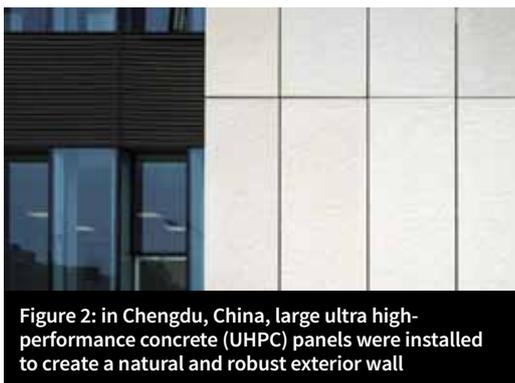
in Chengdu, China, large ultra high-performance concrete (UHPC) panels were installed to create a natural and robust exterior wall
